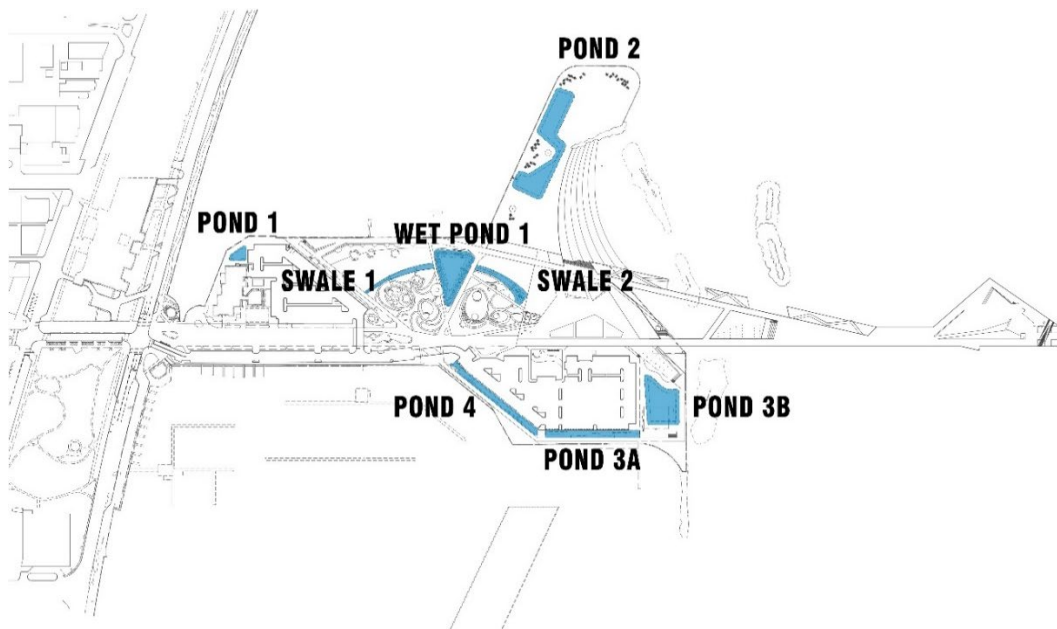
Pier Park Stormwater Treatment Map (Source: Developed based on Kimley-Horn's Drainage Report)
